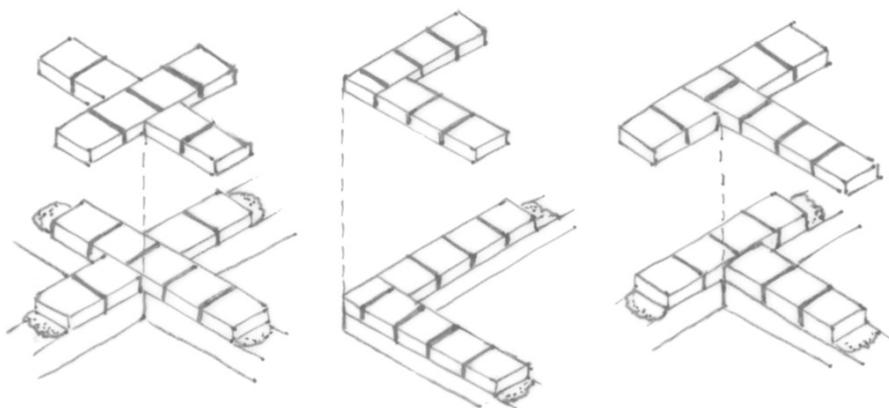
Manner to place the mud bricks: I-shape, L-shape, T-shape, first and second rows in an earthen masonry
